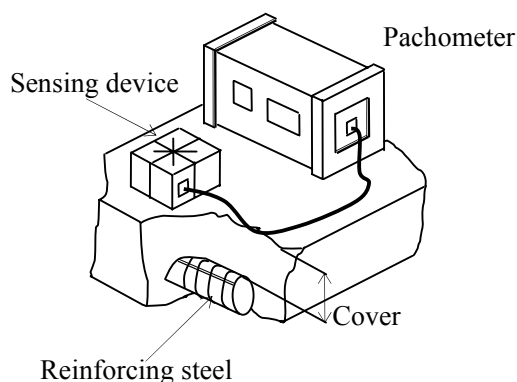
Use of a Pachometer for detecting rebar in concrete
